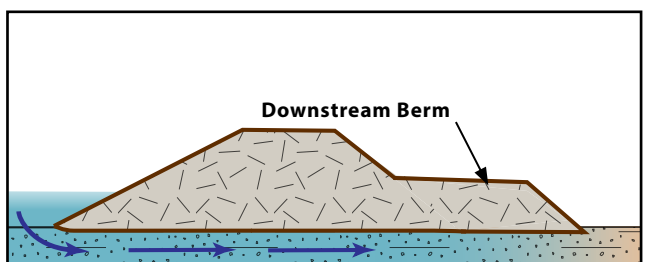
Cross Section of Embankment with Downstream Toe Berm
